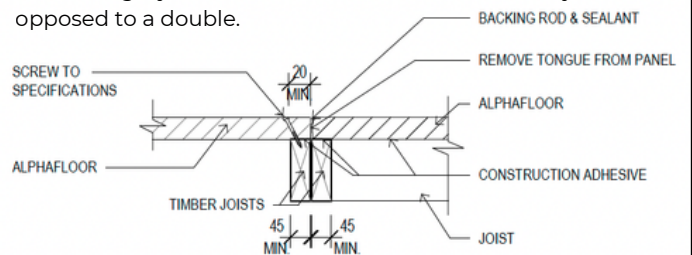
ALPHAFLOOR® CONTROL JOINT LOCATION AT CHANGE IN JOIST ORIENTATION
